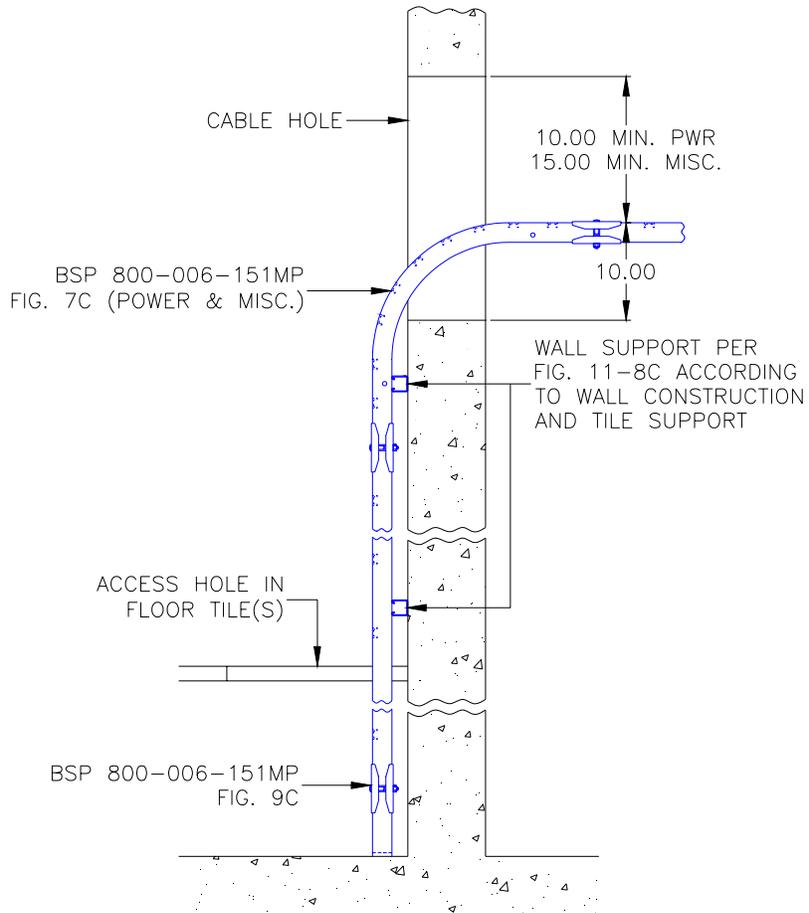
G – Cable Transition Arrangement – Between Rooms and Areas
